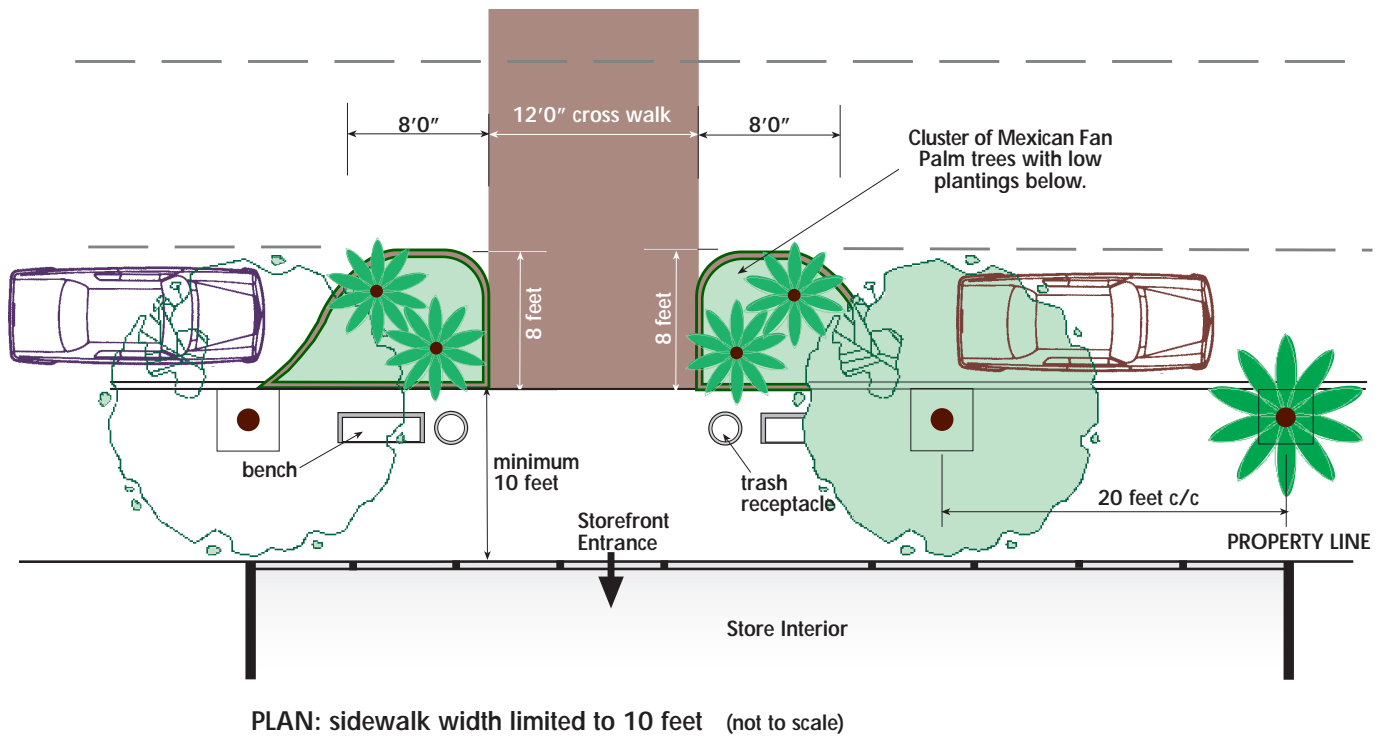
Typical bulb-out layout (plan) for mid-block intersections on Atlantic Avenue
